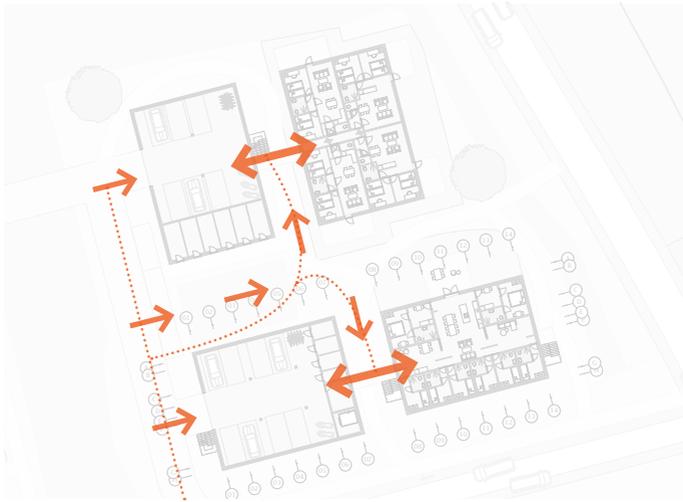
First ground floor, floor plan sketch of apartments in Building B
